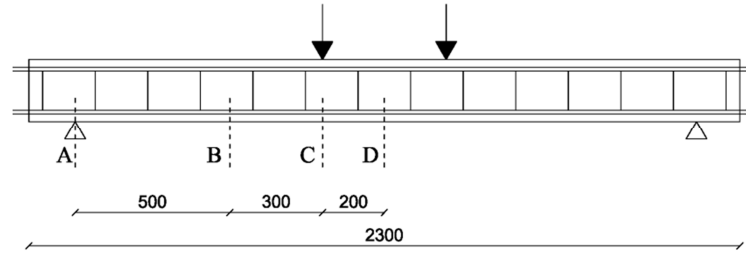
Beam 113 – location of supposed pits in tensile bars
